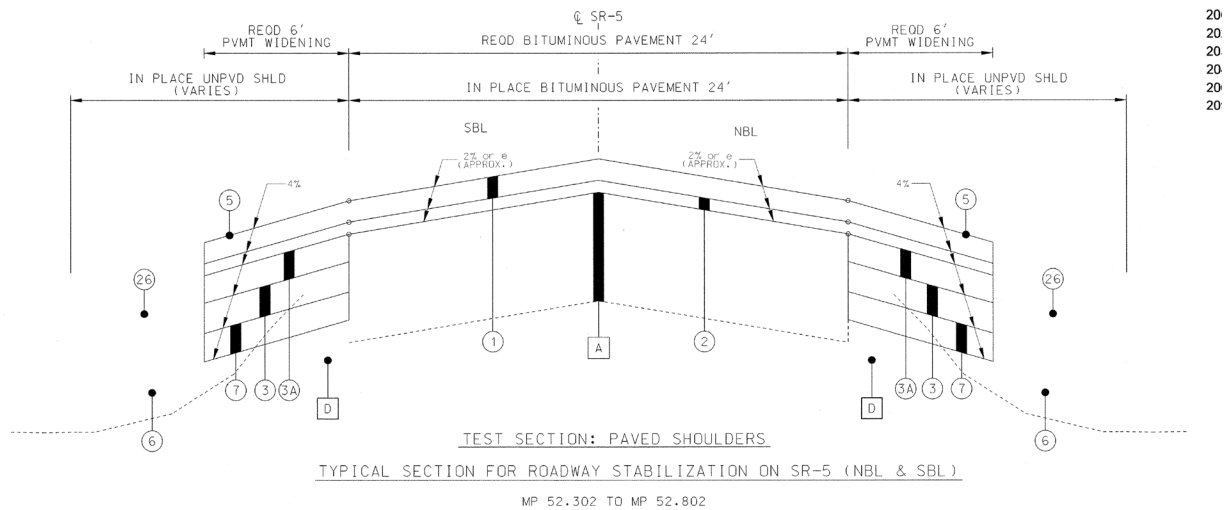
Paved Shoulder Cross Section (ALDOT 2015)
